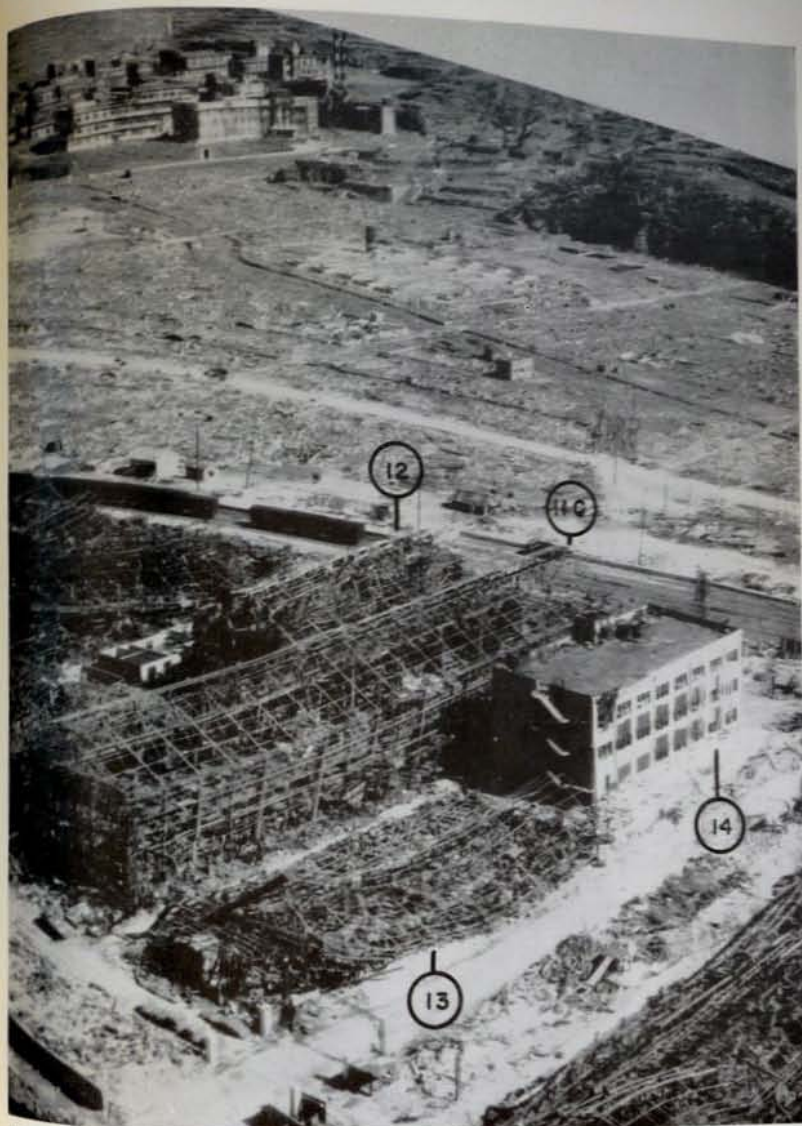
Group 26. Collapsed Building 13 in foreground. Nagasaki Hospital in upper left corner of photo.
